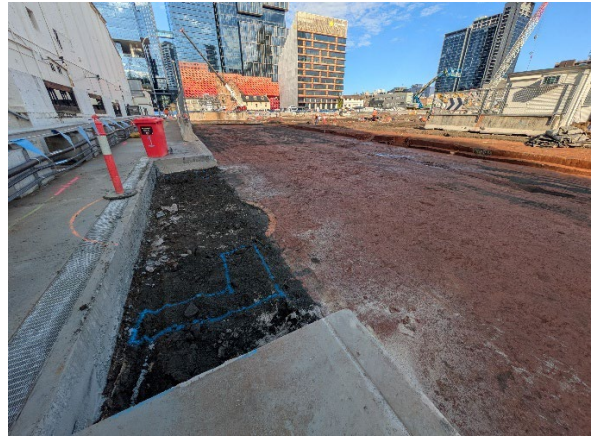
Parramatta Site: TBM 1 traversing through station box.
